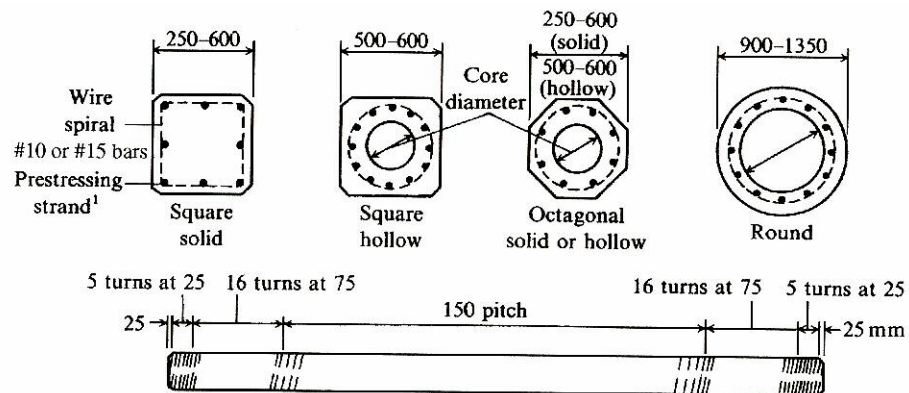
Typical Details of Precast Piles [Source: 4.1]
